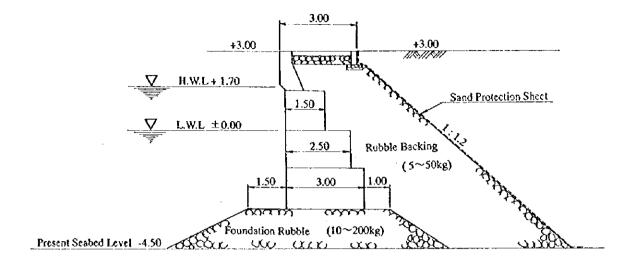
Typical Cross Section of Revetment (Concrete Block)
